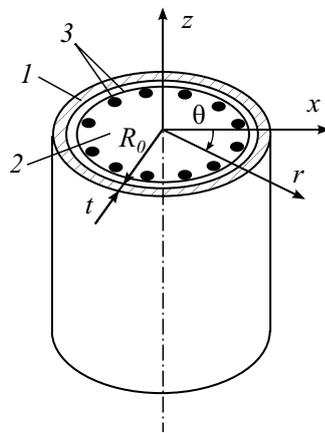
Concrete-filled hollow steel column with reinforcement, where 1 – steel column, 2 – concrete, 3 – reinforcing steel.
